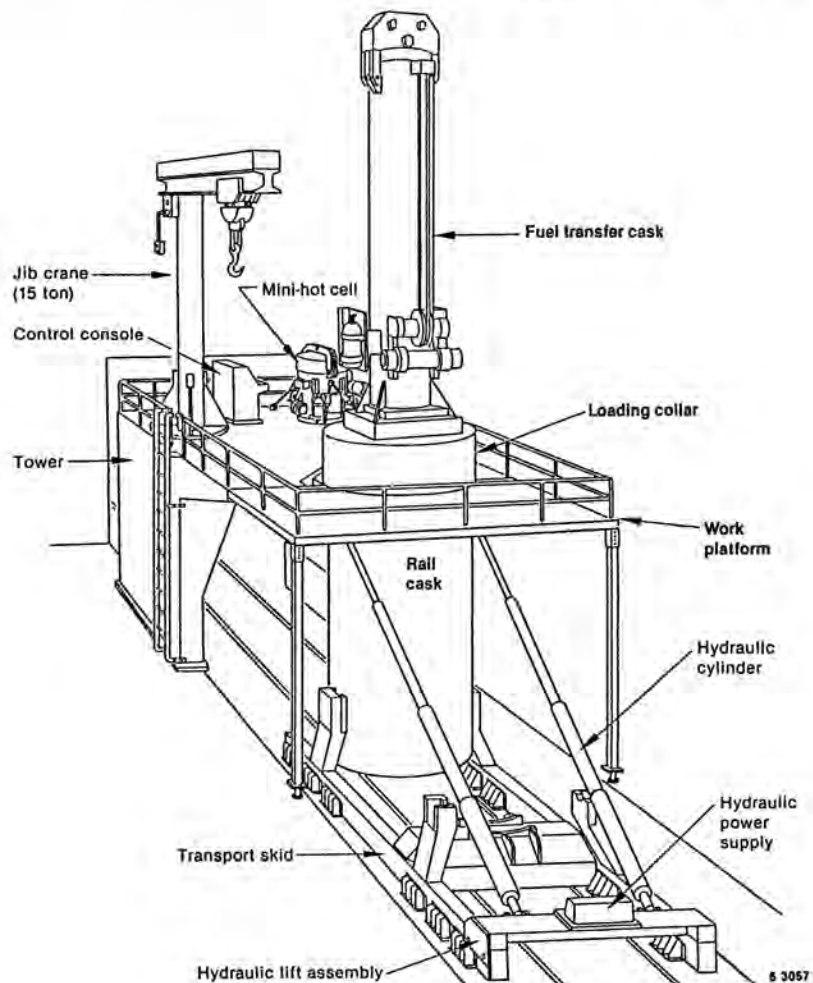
Schematic of the NuPac 125-B Rail Cask being loaded with a core debris canister at TMI-2, using the shielded fuel transfer cask.
